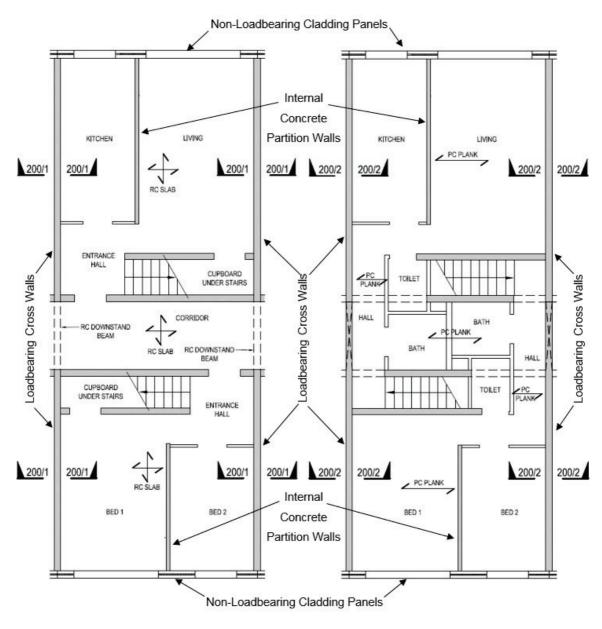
Example of floor plan of duplex flat in 6-storey dwelling block (Flat 2 Manston)
